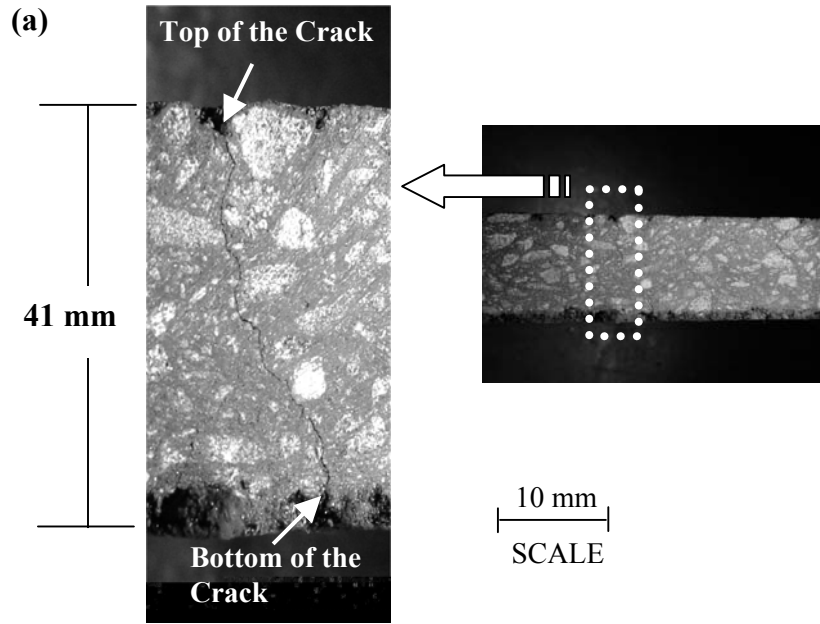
Fatigue Alligator Cracking Pattern in RI-1 Pavement:
